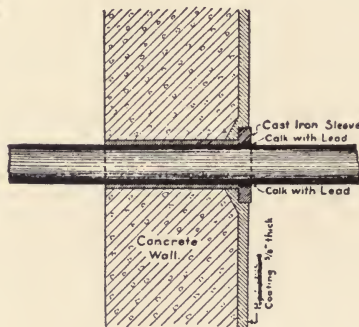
Passing Pipe Through Concrete Wall. Method of Making Water-tight Joint.
